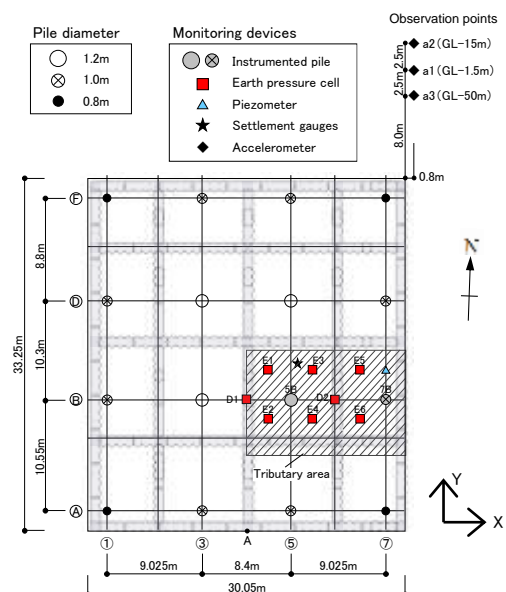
Layout of piles and grid-form deep mixing walls with locations of monitoring devices.
